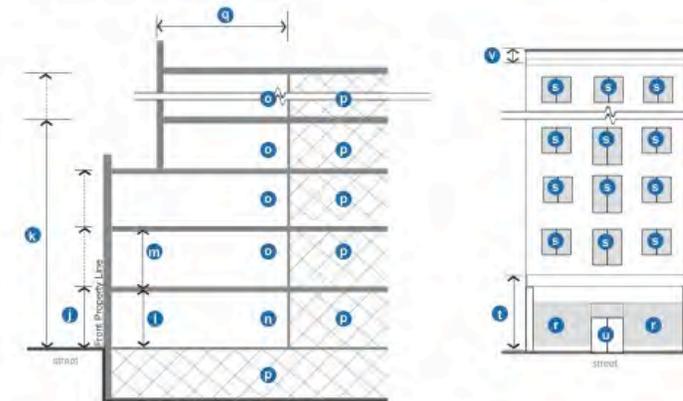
(2). Storefront Building: Height & Use Requirements.
